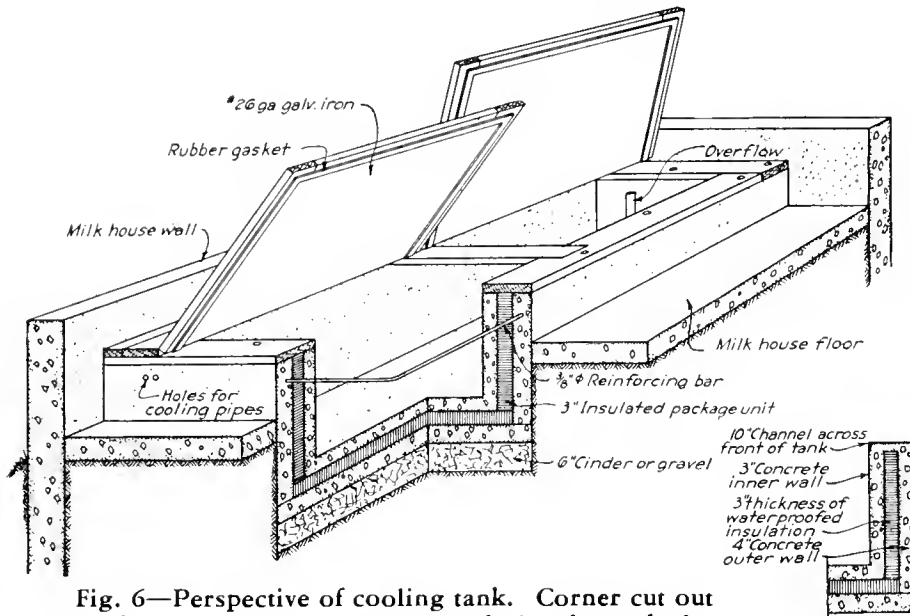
Perspective of cooling tank. Corner cut out to show construction. Alternate design for tank rim shown at right.
